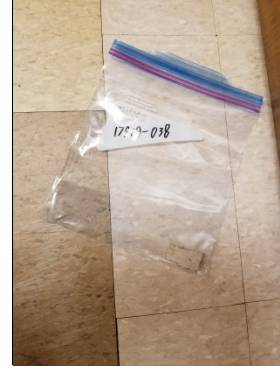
Black mastic beneath found beneath floor tiles and green carpet in the basement. (May 22, 2018)
